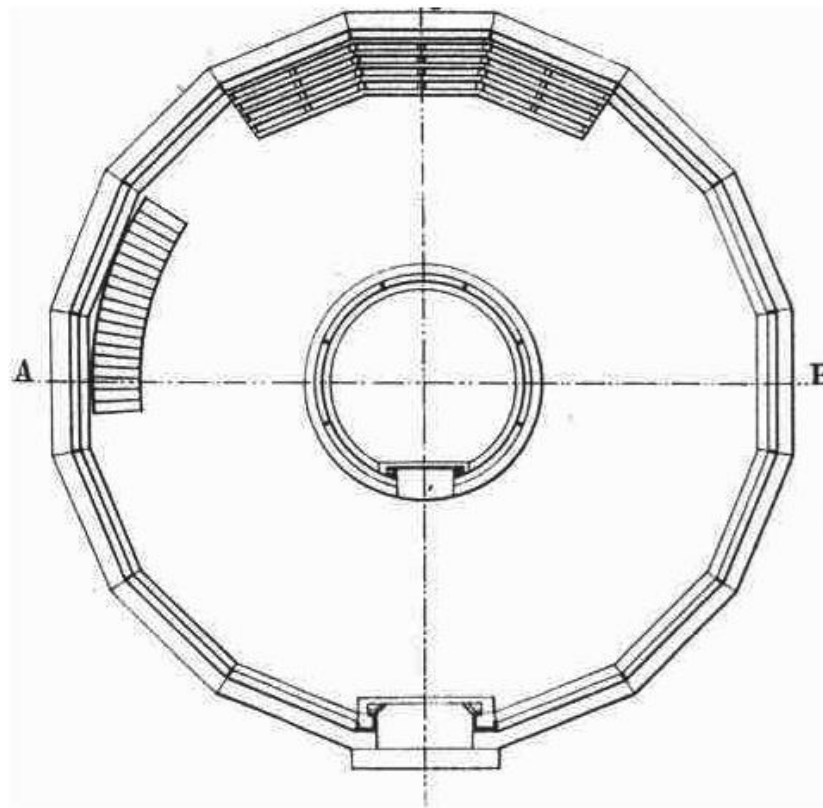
Cross section outer column of the lighthouse (Harder, 1875)
